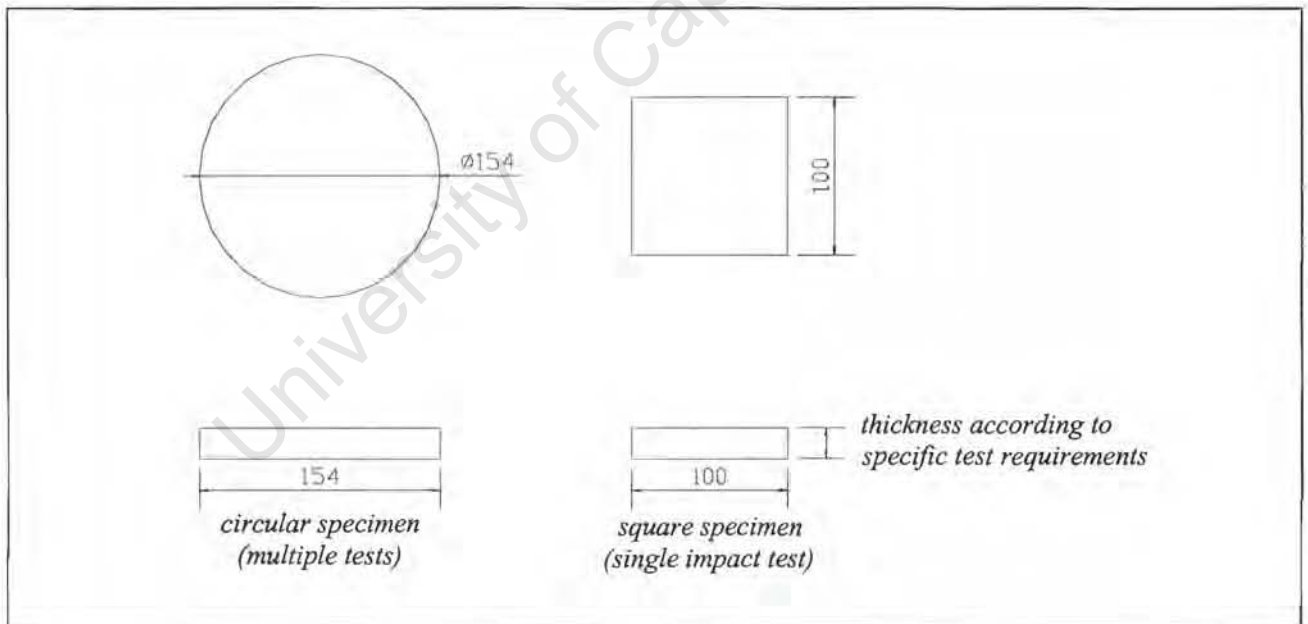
Recommended test specimen dimensions for clamped circular and square specimens.
